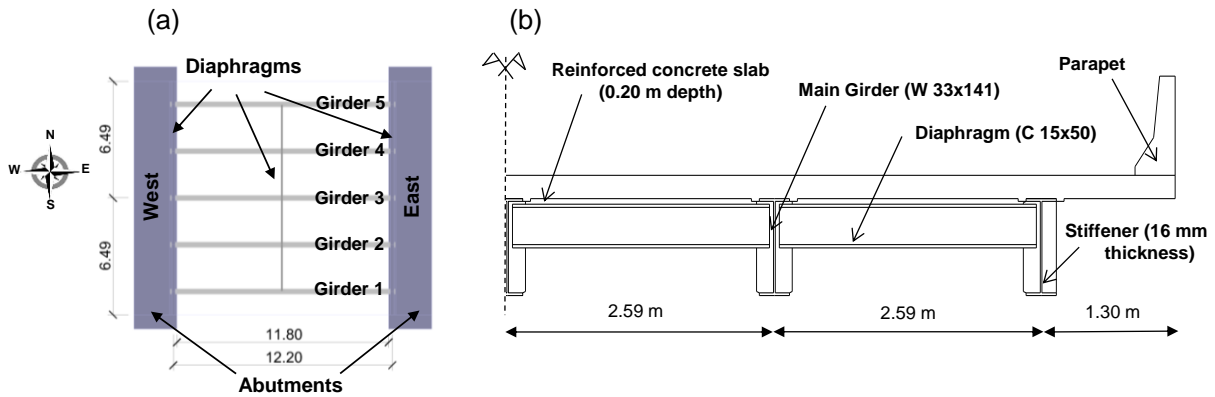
Bridge definition. (a) Plan view (without the concrete slab), (b) half section.
